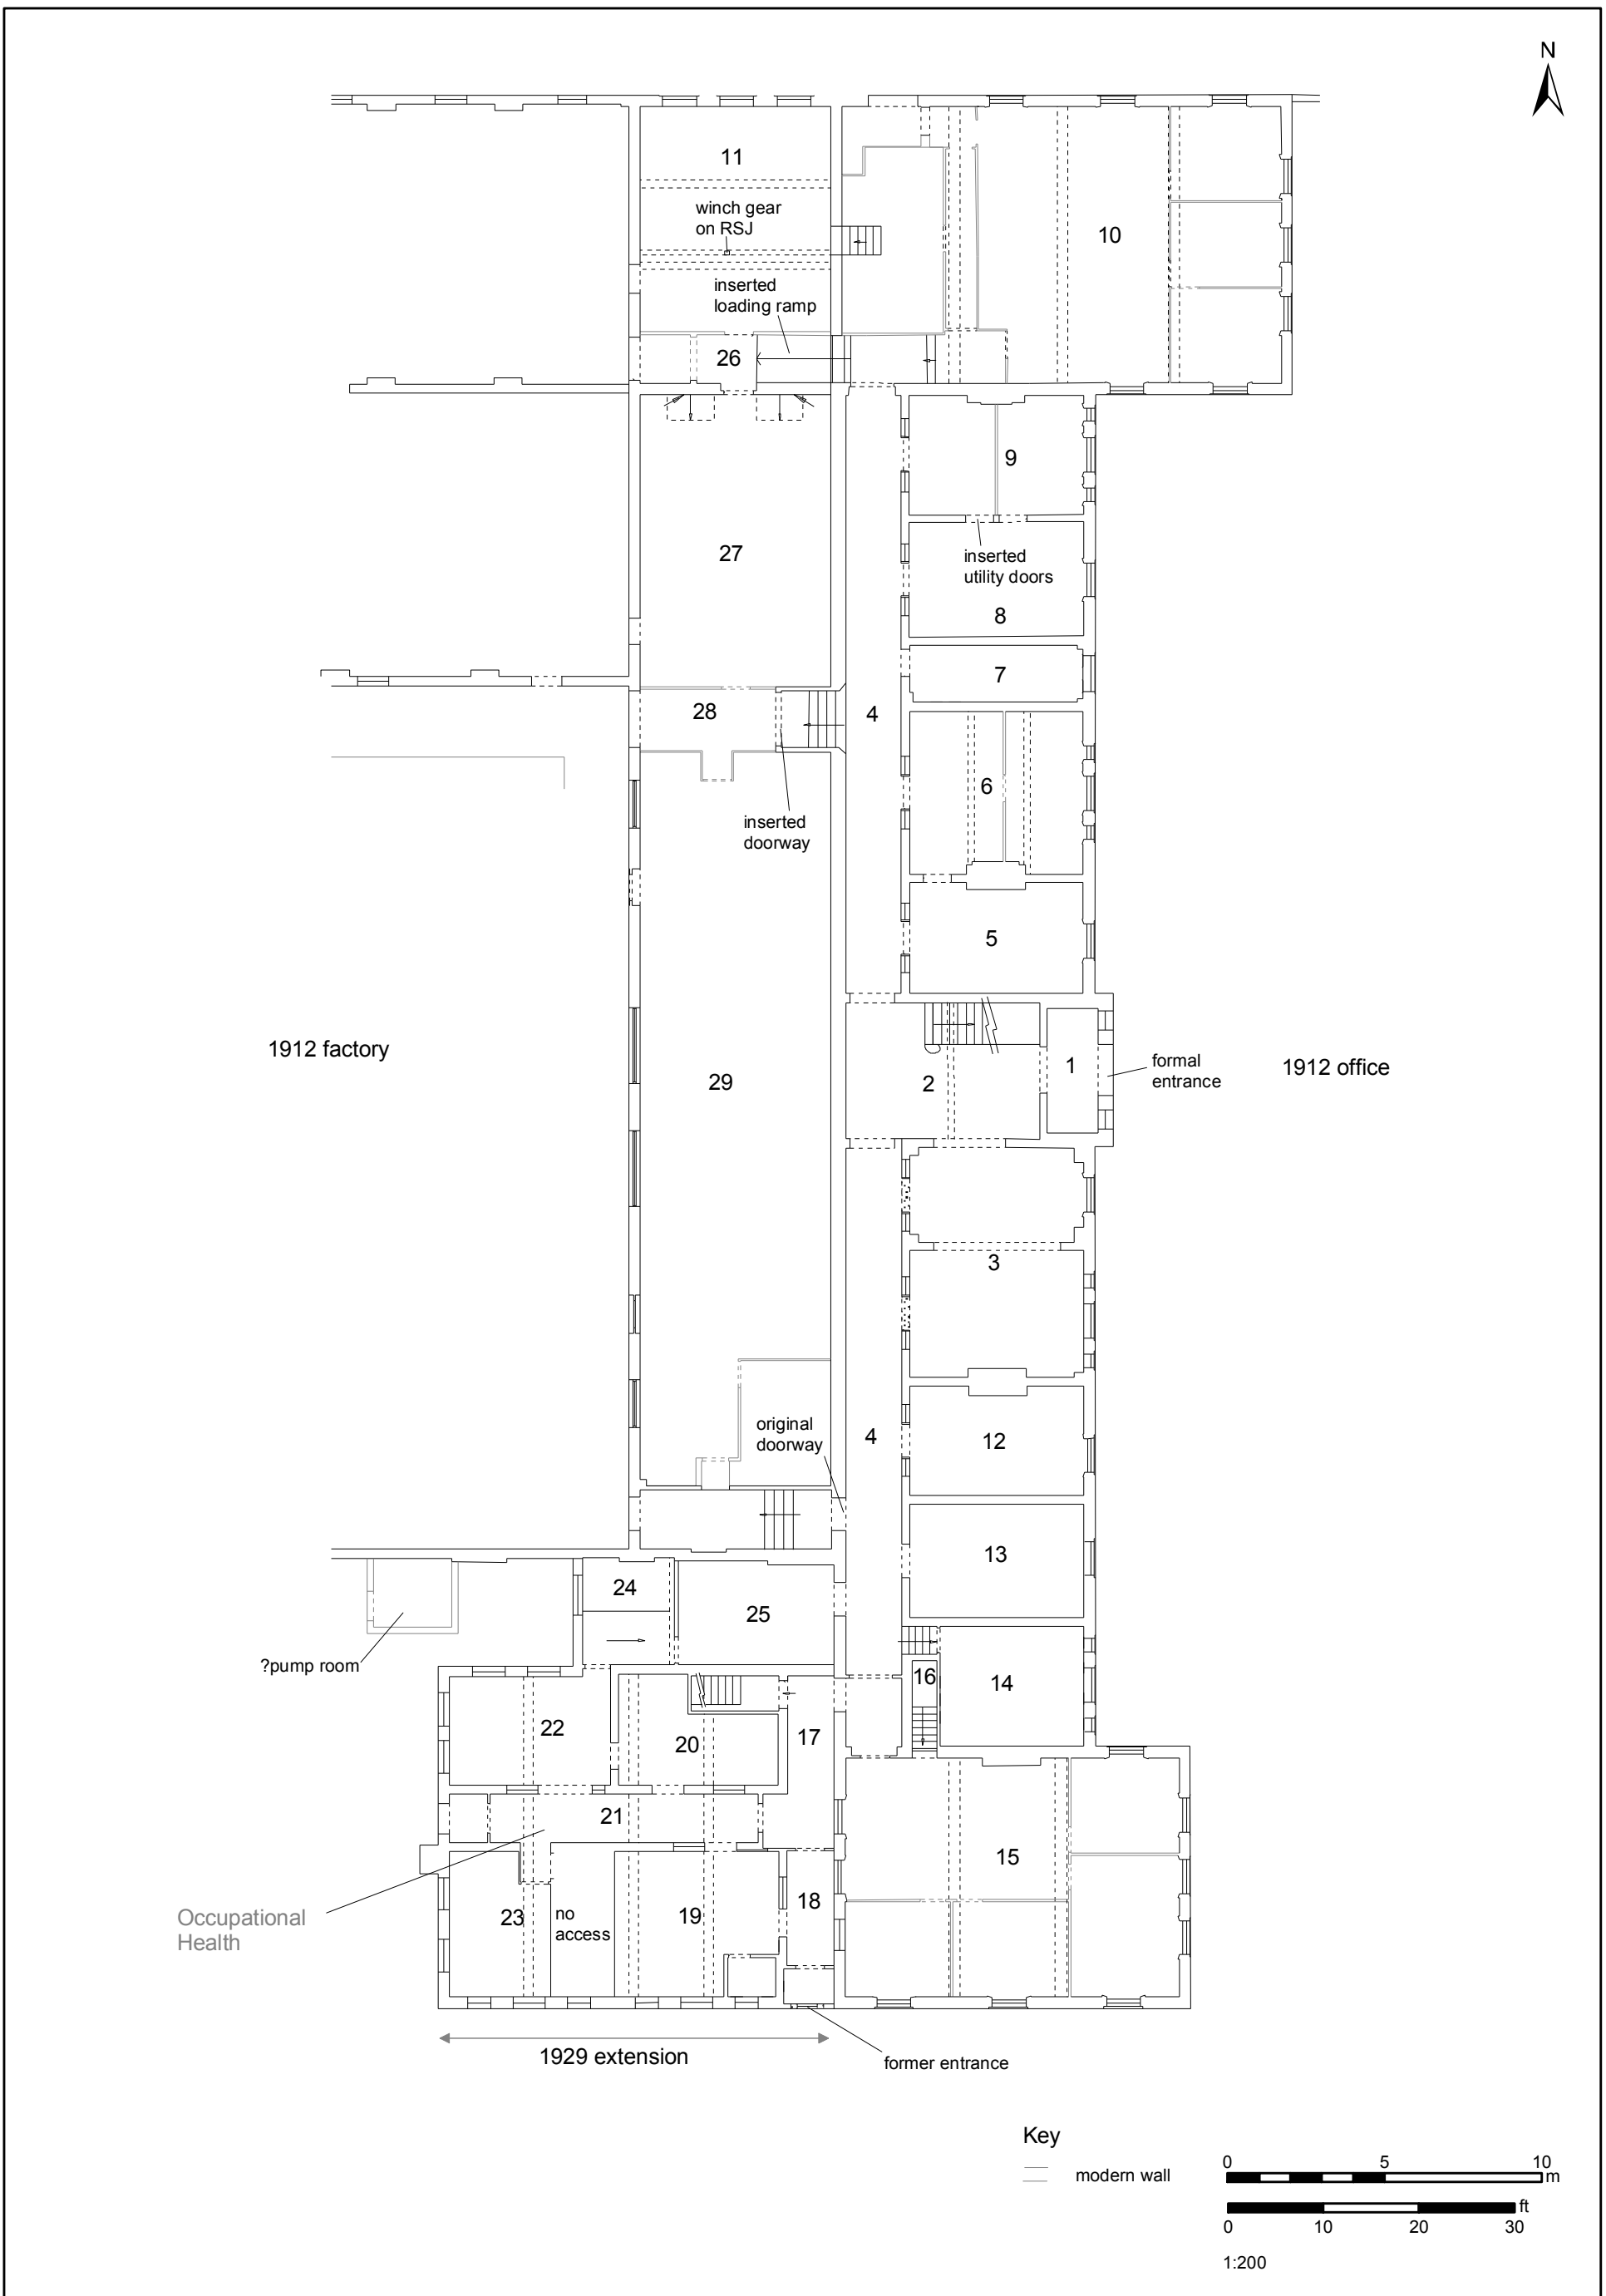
1912 offices and 1920s extension - ground floor plan
